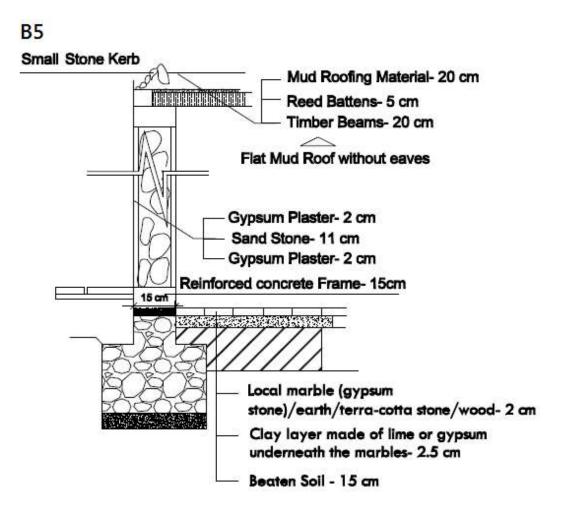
Construction Technique in British period- Stone walls and Concrete Structure- B₅
